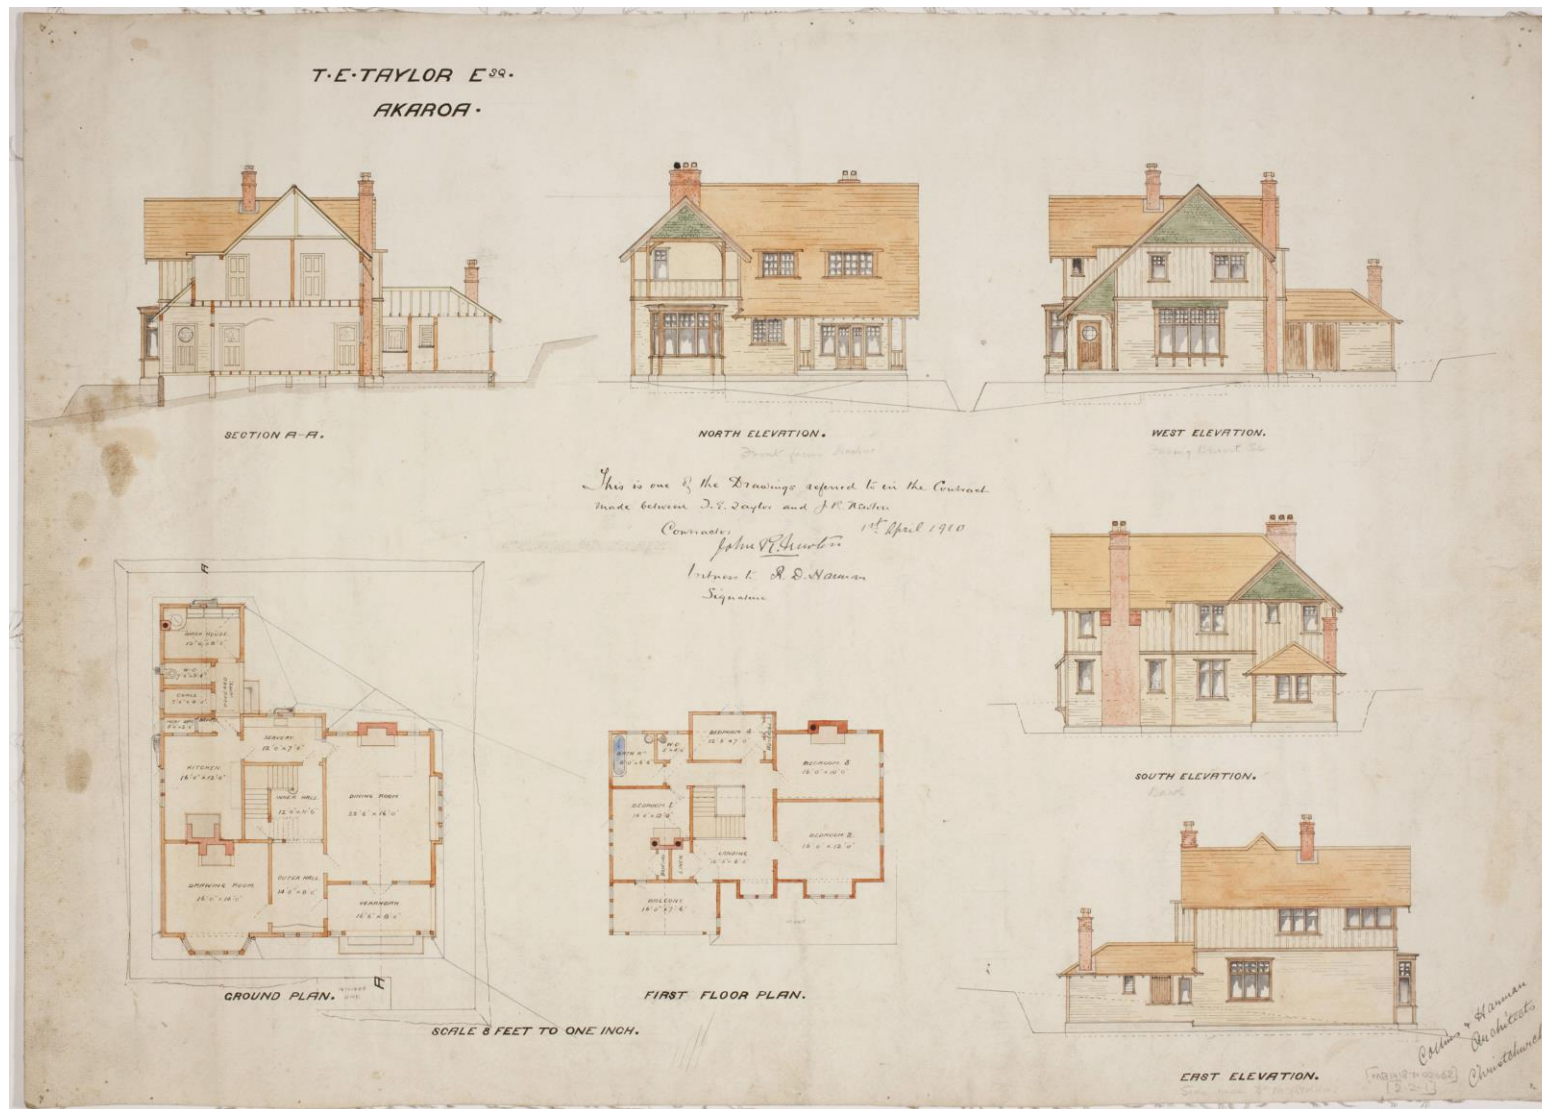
Collins and Harman, T. E. Taylor, Esq., Akaroa, plans, elevations and section (1910).
